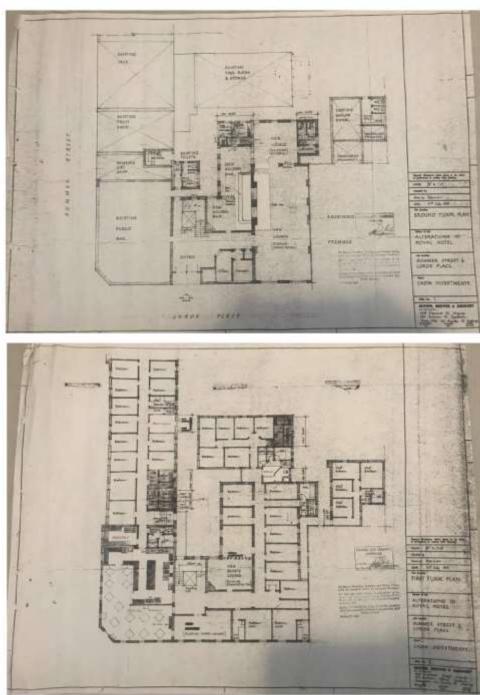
| Top: Ground Floor. Bottom: First Floor. July 1959 plans drawn by Brown, Brewer and Gregory for alterations to the Royal Hotel. The kitchen and dining room were moved upstairs, lounges were reconfigured, and new bathrooms were installed. [Orange City Council]
